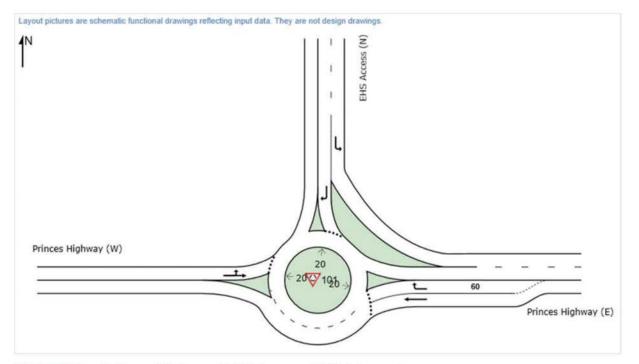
Princes Highway / EHS Access SIDRA Layout
